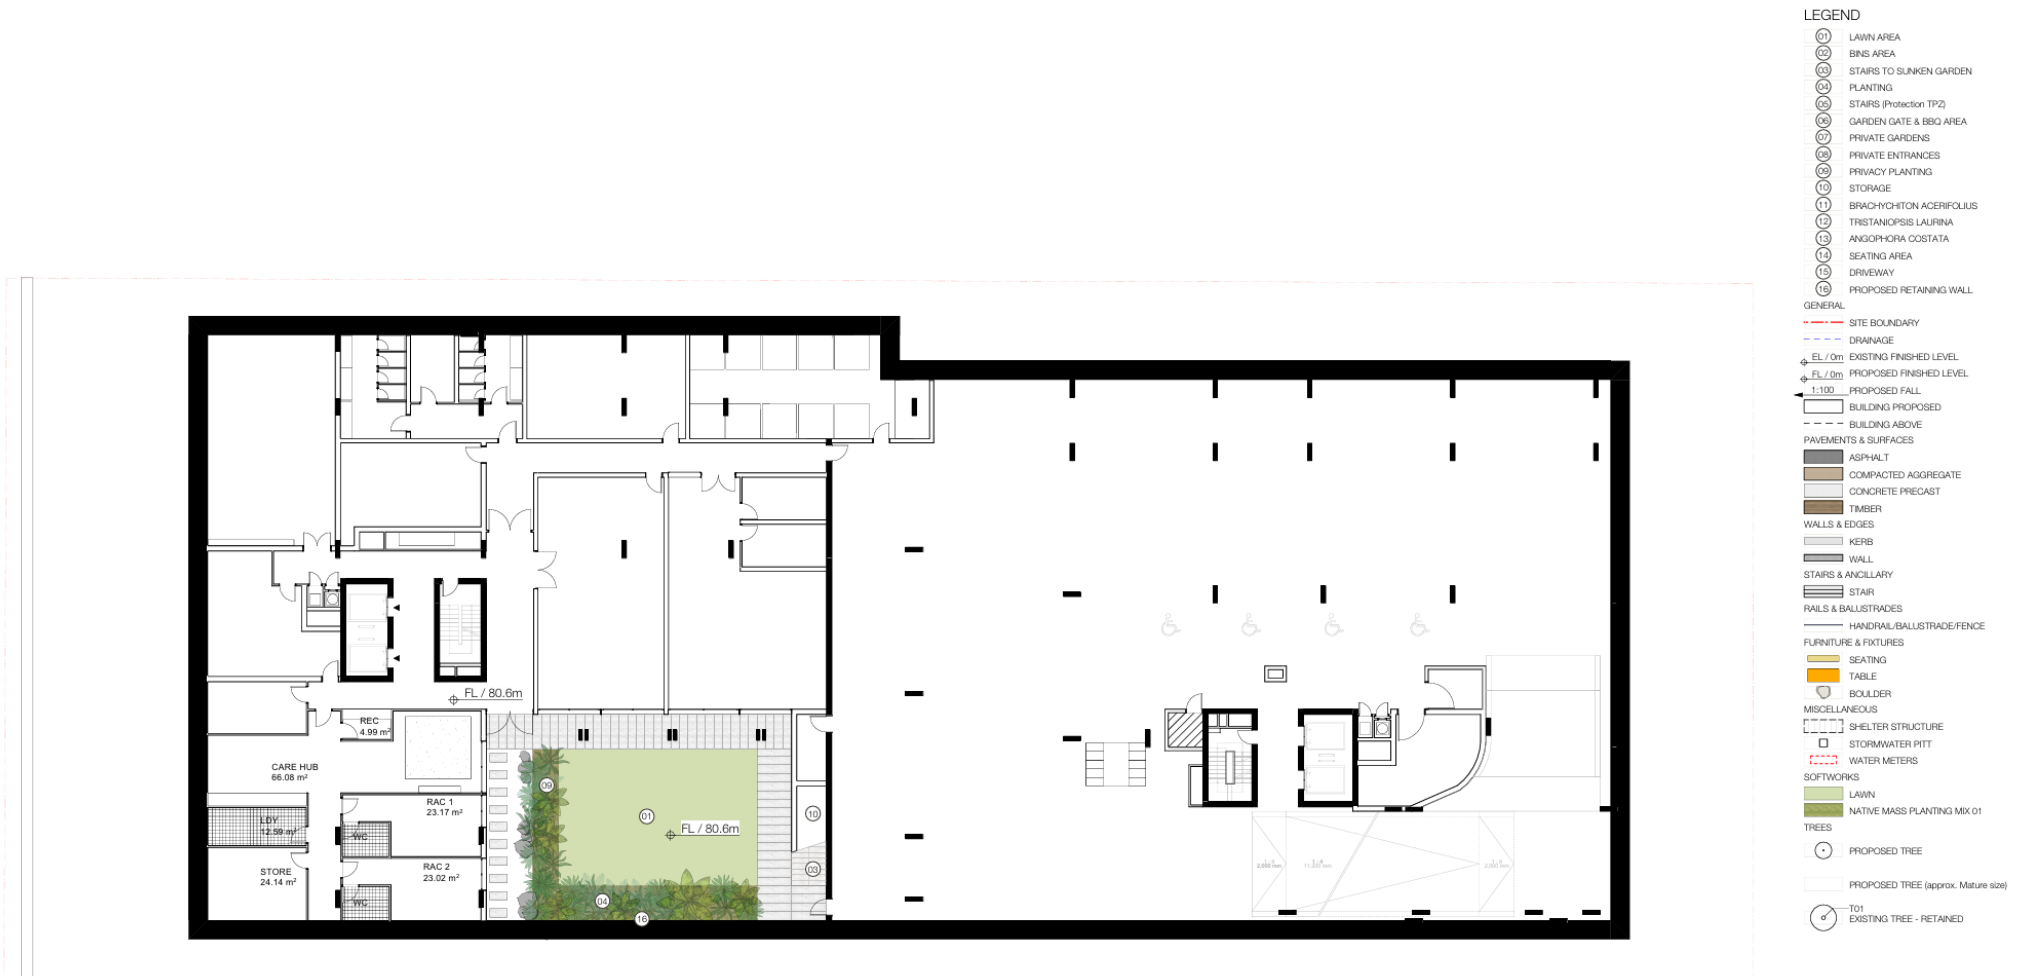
Landscape Concept Plan (sunken courtyard).
